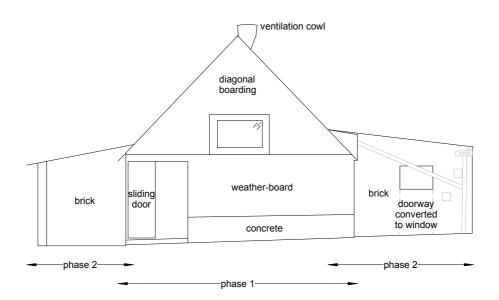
Structure 10, 1898-1918 milking shed north elevation.
